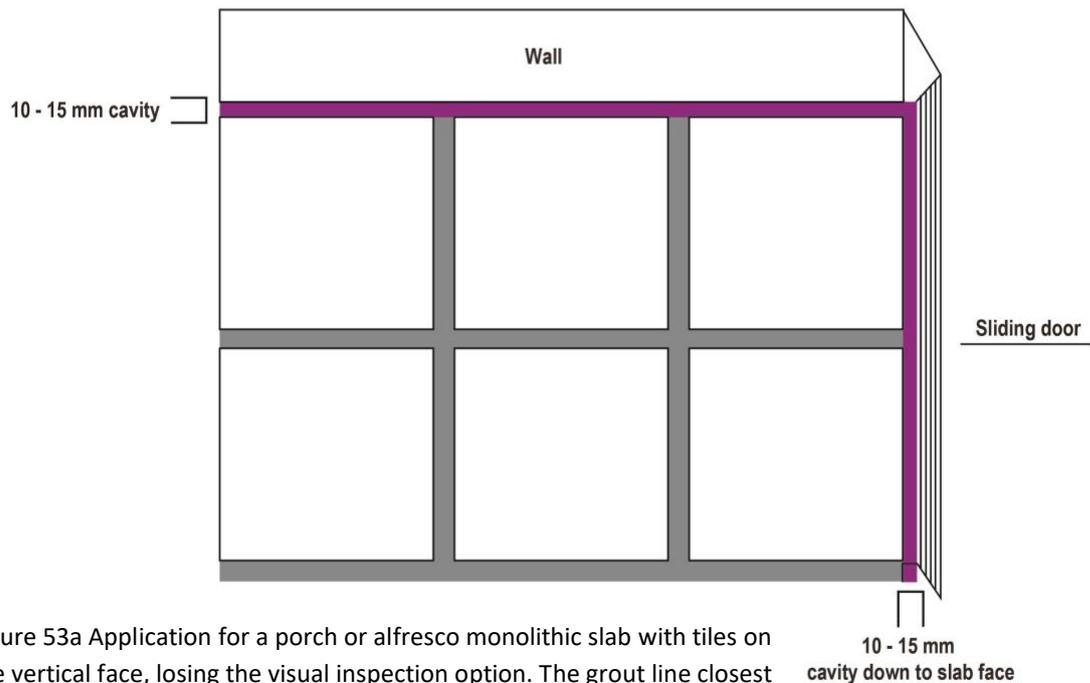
Application for a porch or alfresco monolithic slab with tiles on the vertical face, losing the visual inspection option. The grout line closest to the wall of the house must be cleaned out and replaced with a bead of NOVITHOR Flexi-gel at the slab level next to the last tile.
